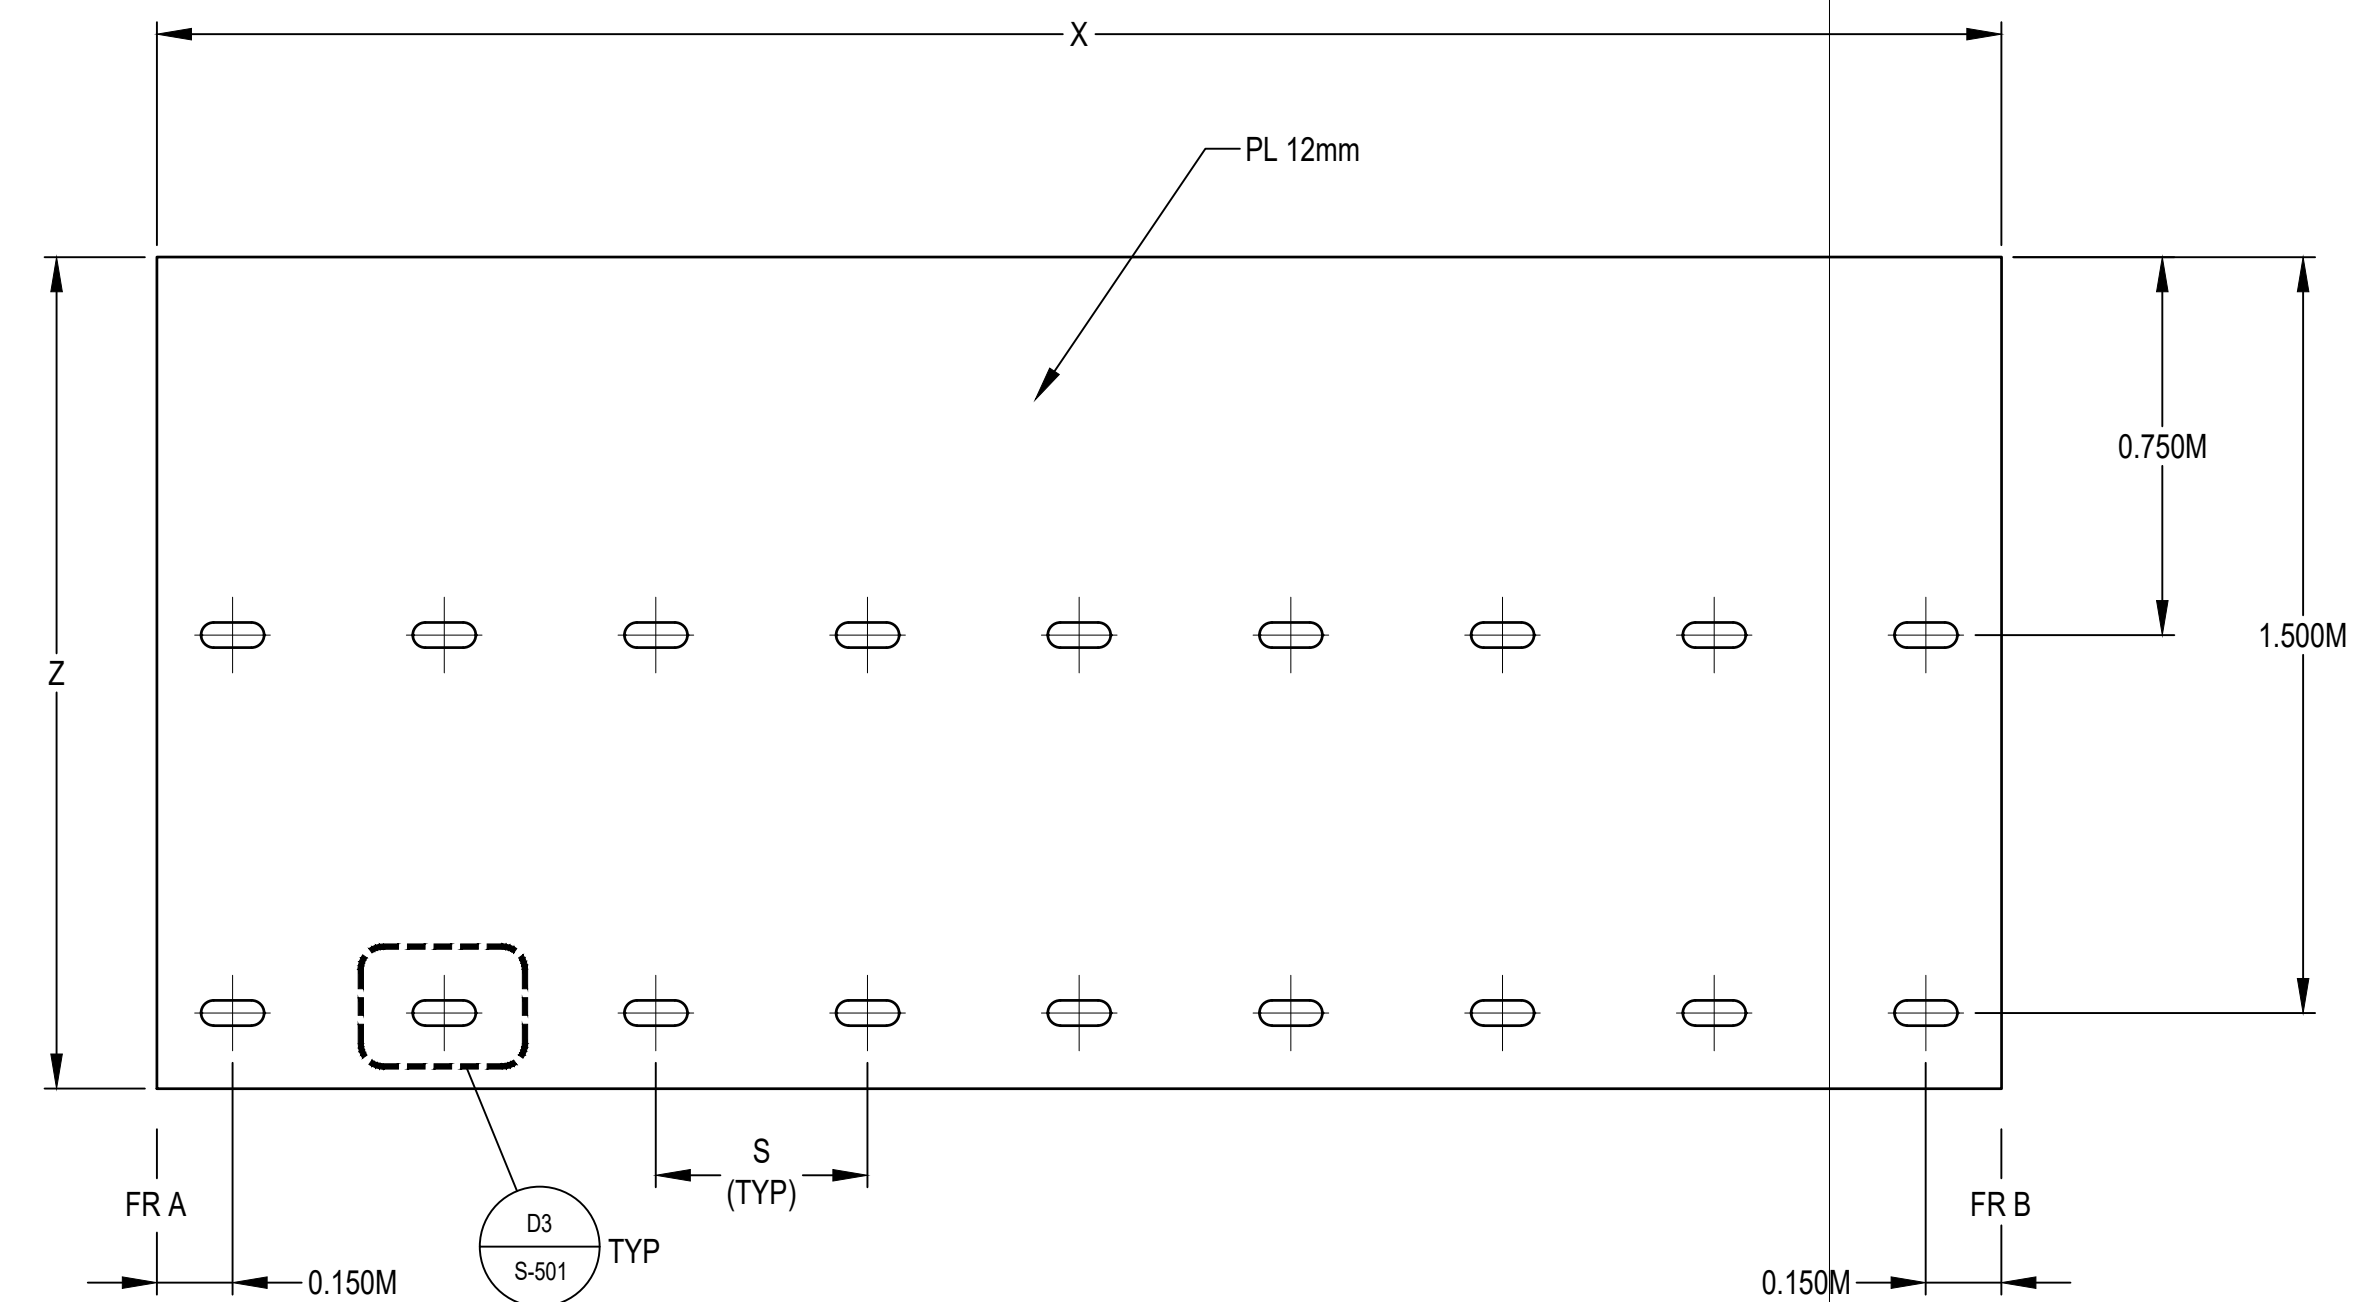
DETAIL - TYP TYPE 1W PL PANEL (C1)
